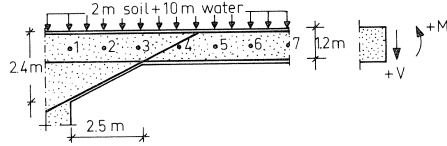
Section through a half tunnel roof with haunch; the manner in which positive forces ( $M, V$ ) act on the section is shown on the right.
